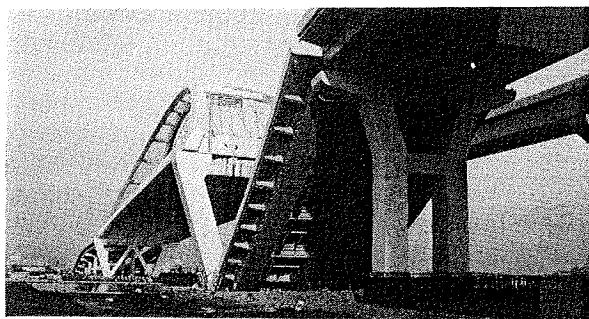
Collapse of an Approaching Bridge to Nishinomiya Bridge, Route 5, Bay Shore Line, Hanshin Expressway
